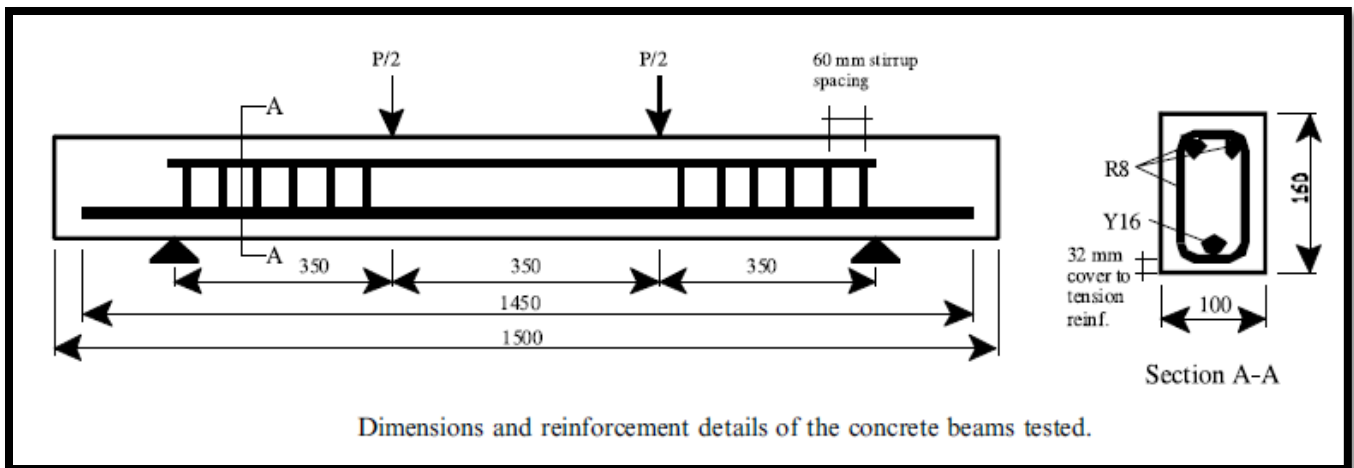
Dimensions and reinforcement details of the concrete beams tested (Ballim et al 2003)
